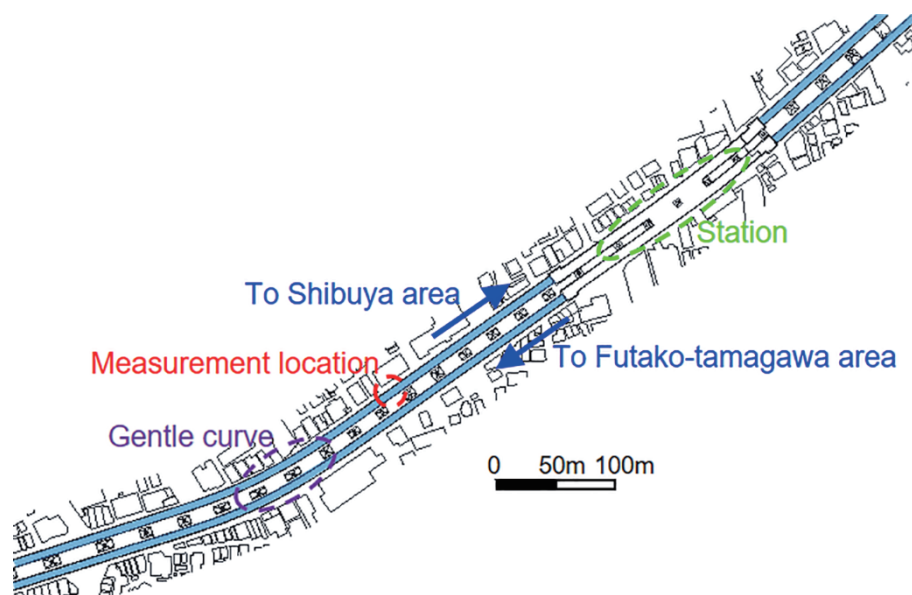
(Color online) Plan view of target shield tunnel (units: m).
